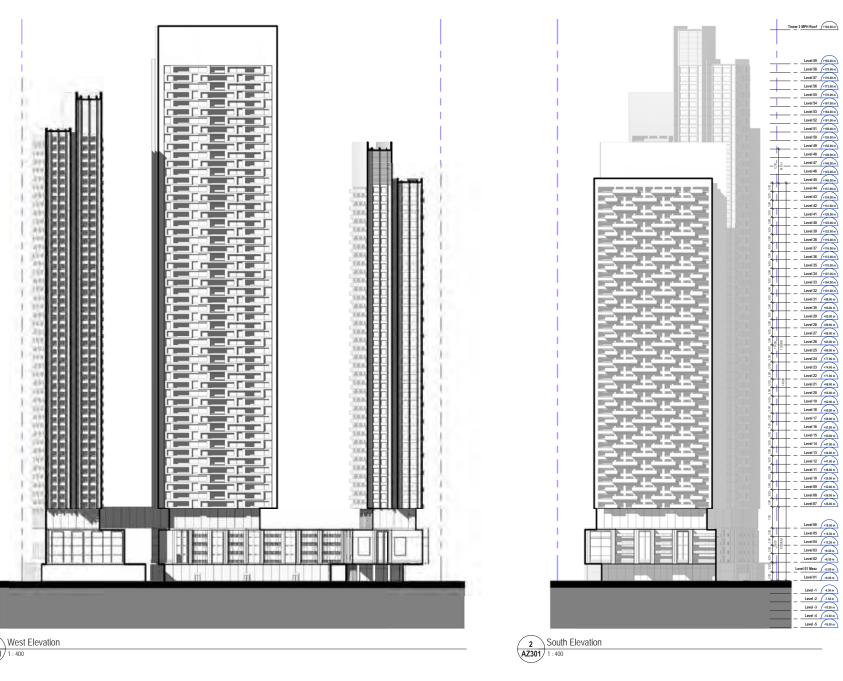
West and South Elevations (Prepared by: Sweeney & Co.)
